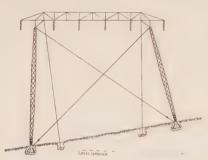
FRONT ELEVATION, TWO-CIRCUIT POST TYPE TOWER ON ONE-IN-FIVE TRANSVERSE GROUND SLOPE
